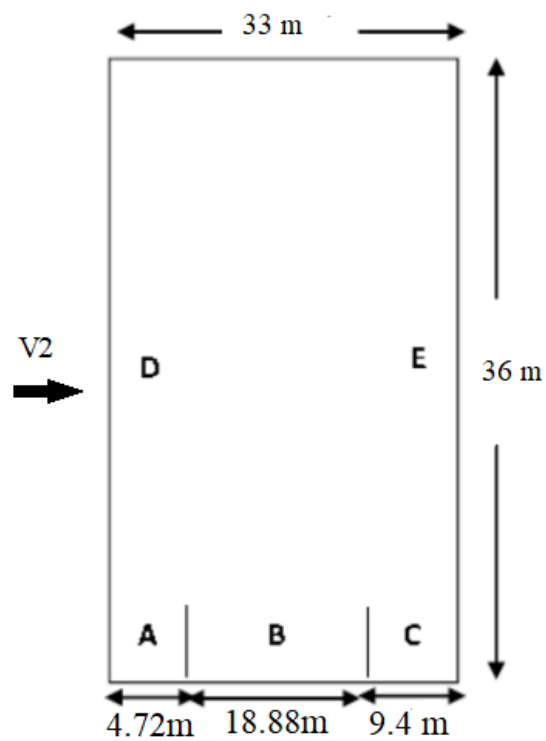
Plan view of the pressure zones on the vertical walls direction V2
